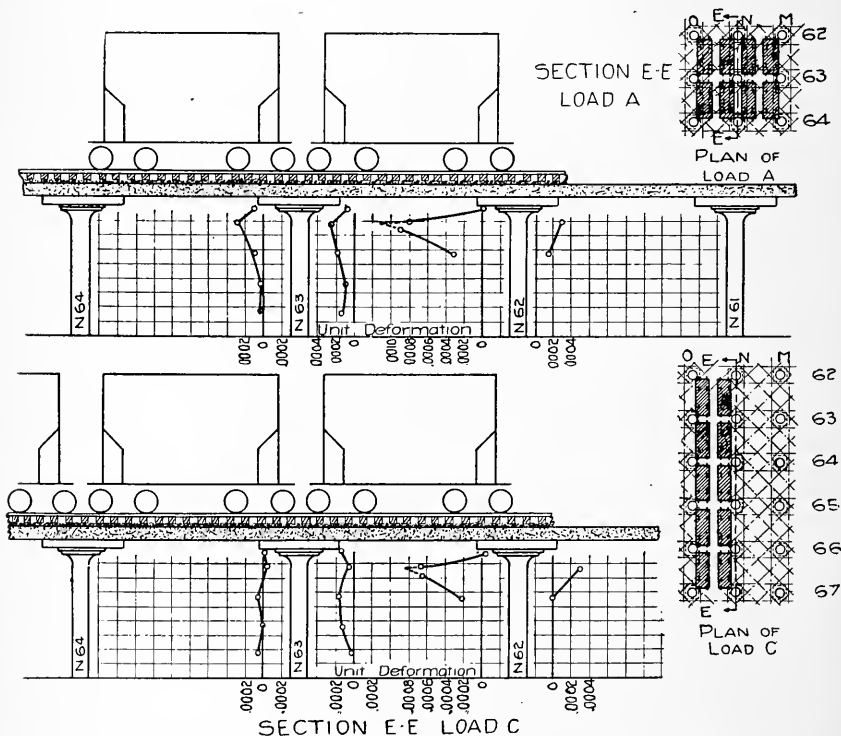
DEFORMATION IN COLUMNS CUT BY SECTION E-E (PARALLEL TO TRACKS) OF SOO TERMINAL STRUCTURE.
